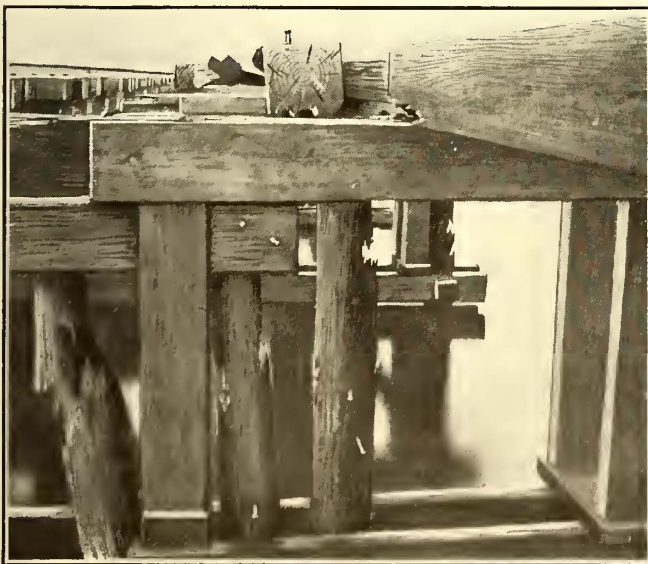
Track Maintenance—Typical Example of Timber Decay
